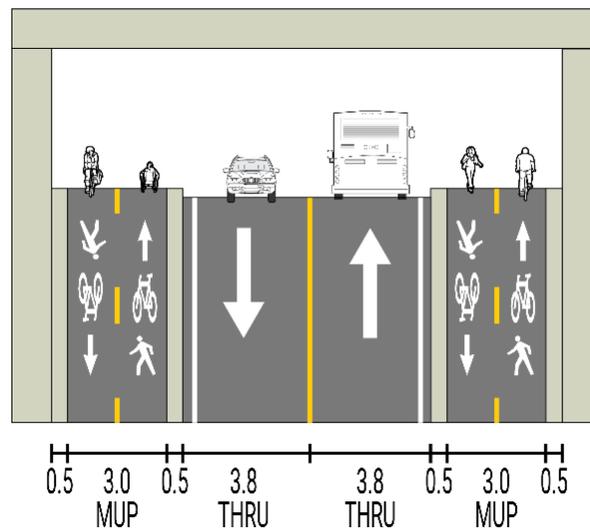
Near-term cross section at the Highway 102 underpass for multi-use pathways on both sides alternative
